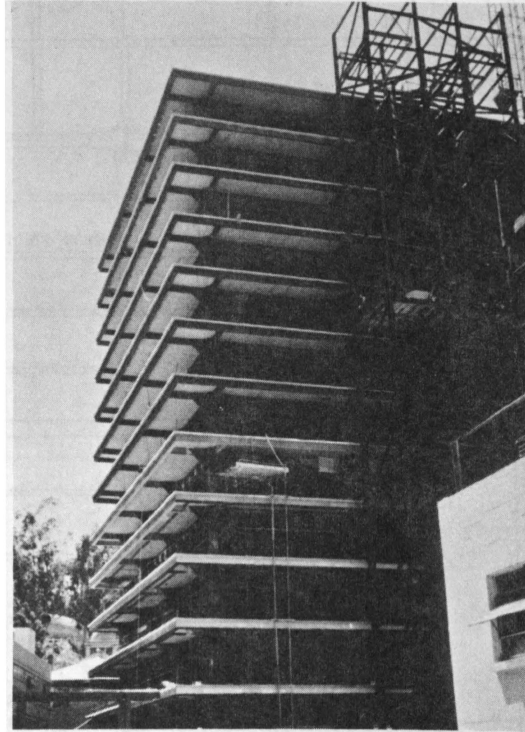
STEEL TRUSS OF EAST MECHANICAL SERVICE TOWER
